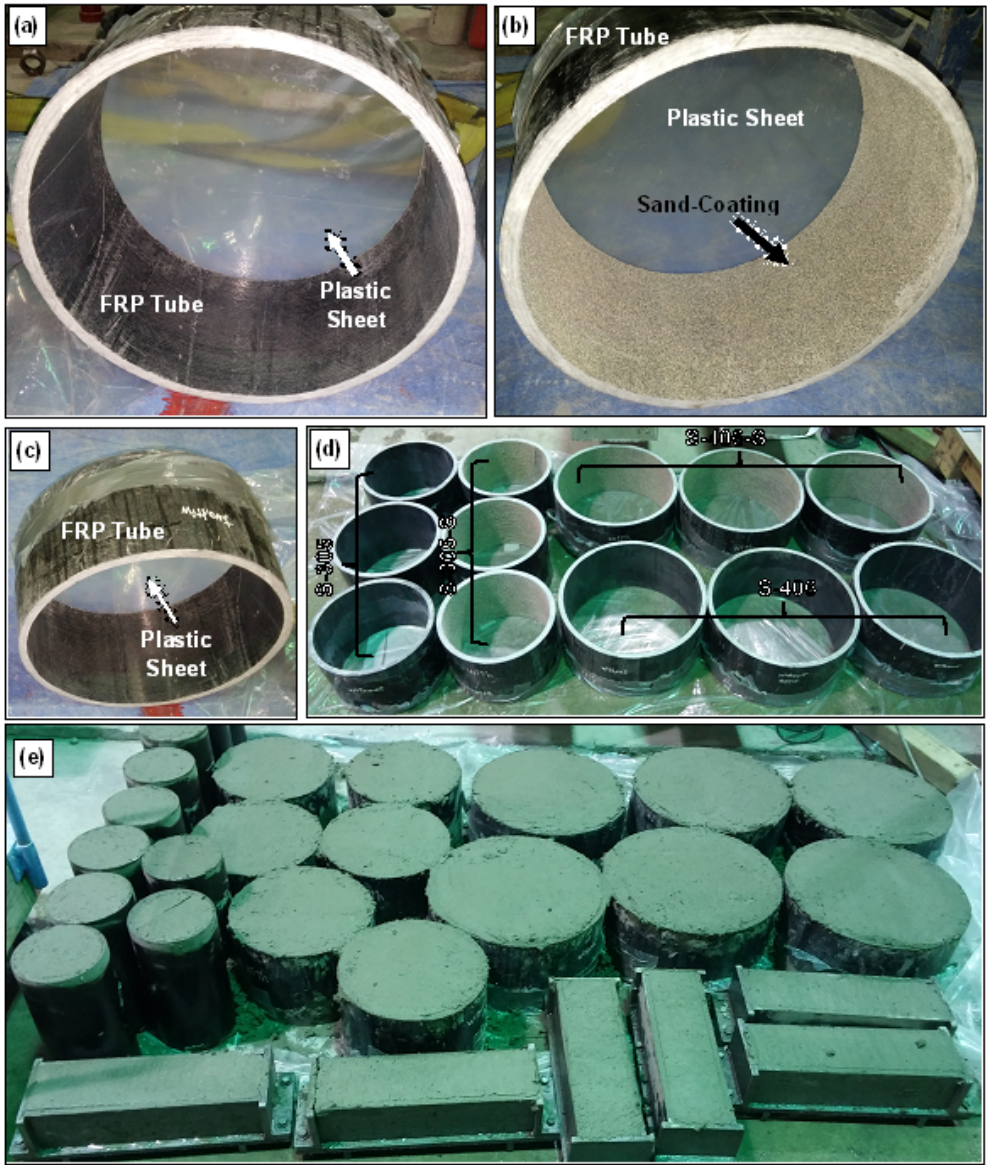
Preparation of specimens: (a) Specimen without sand-coating, (b) Specimen with sand-coating, (c) Closing of the bottom end of the specimen, (d) All specimens before concrete casting, (e) Specimens before casting of concrete
